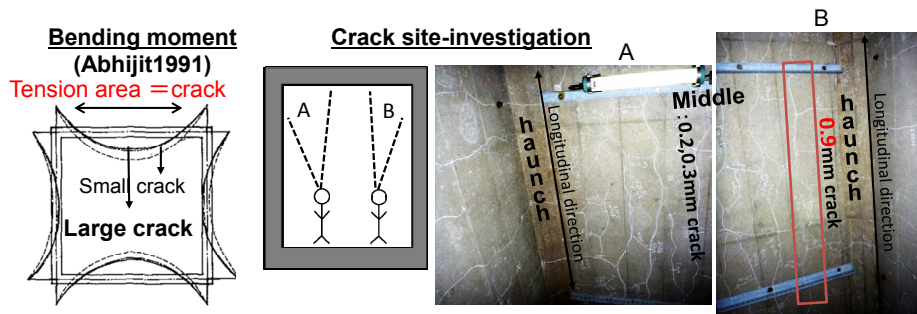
Site inspections of problematic cracks near the corner of the box section.
